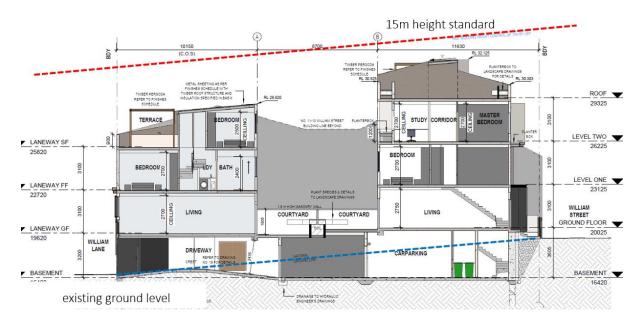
Section Plan showing partial basement under dwellings T8-T14 (William Street) and above ground parking areas under dwellings T1-T7 (William Lane)
